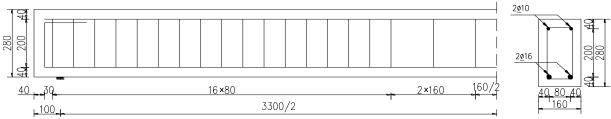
Typical dimensions and reinforcement details of the control beam specimen (unit in mms)
